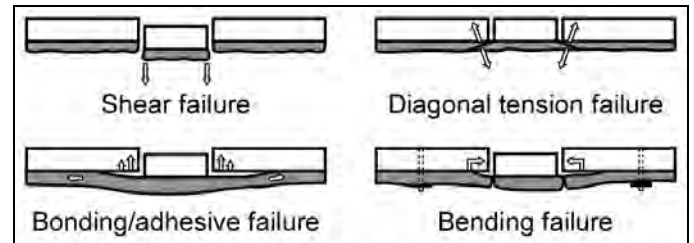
Shotcrete failure modes (Rose, 1985).
